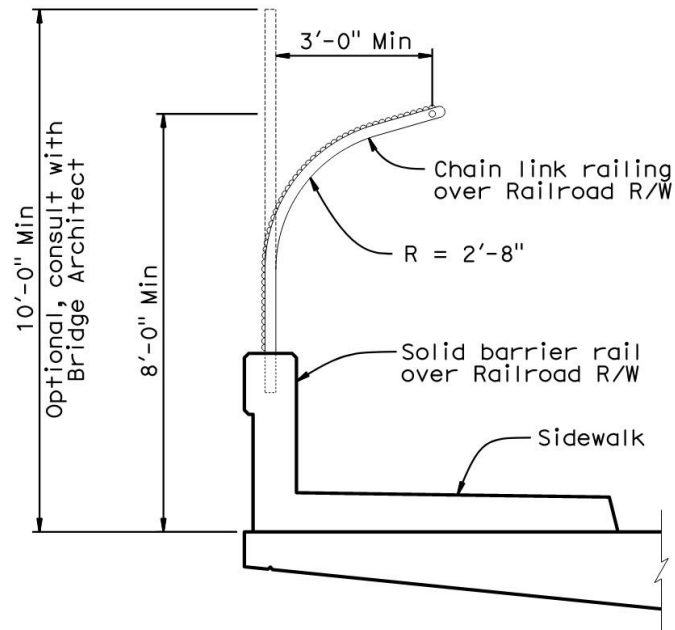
A.A.2 Typical Fence on Barrier with Sidewalk Detail
